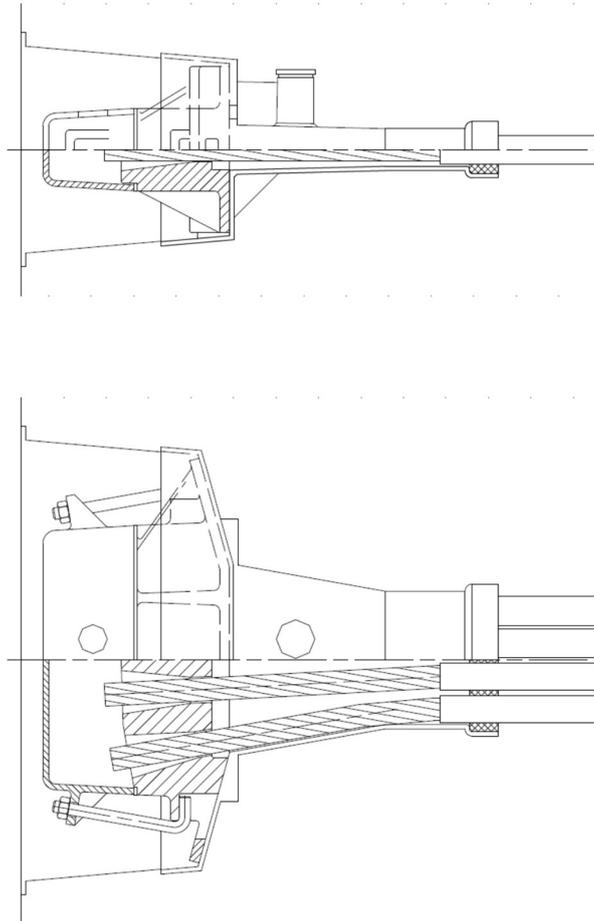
SK 6-1 SL Spring loaded coupler assembly drawing
